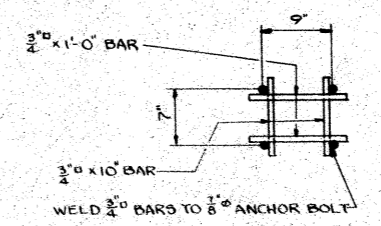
DETAIL OF BAR PART OF PRESTRESSED GIRDERS
